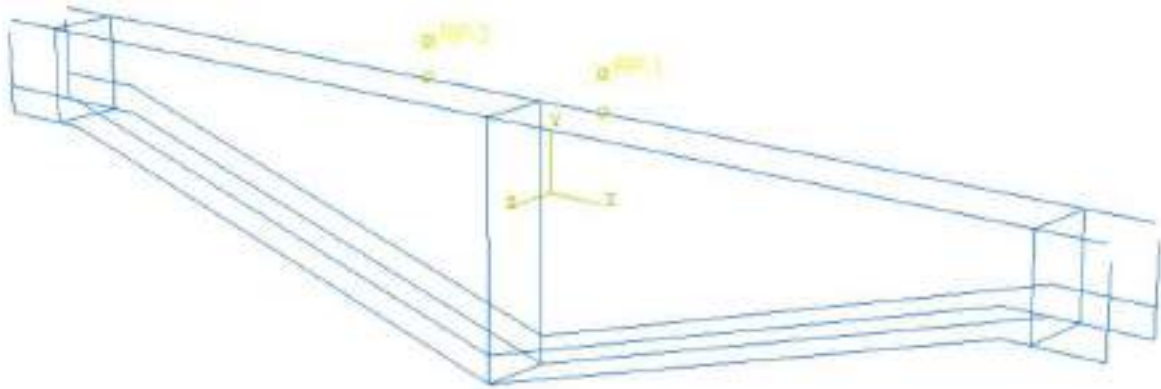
Concrete section geometry of specimen TB6 with a hole at the top.
